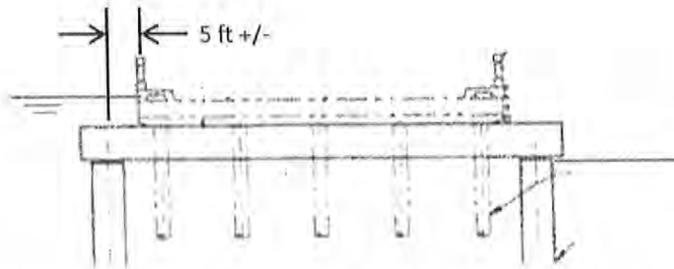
The Gap Between the 36-inch Pier and the Existing Bridge Deck
